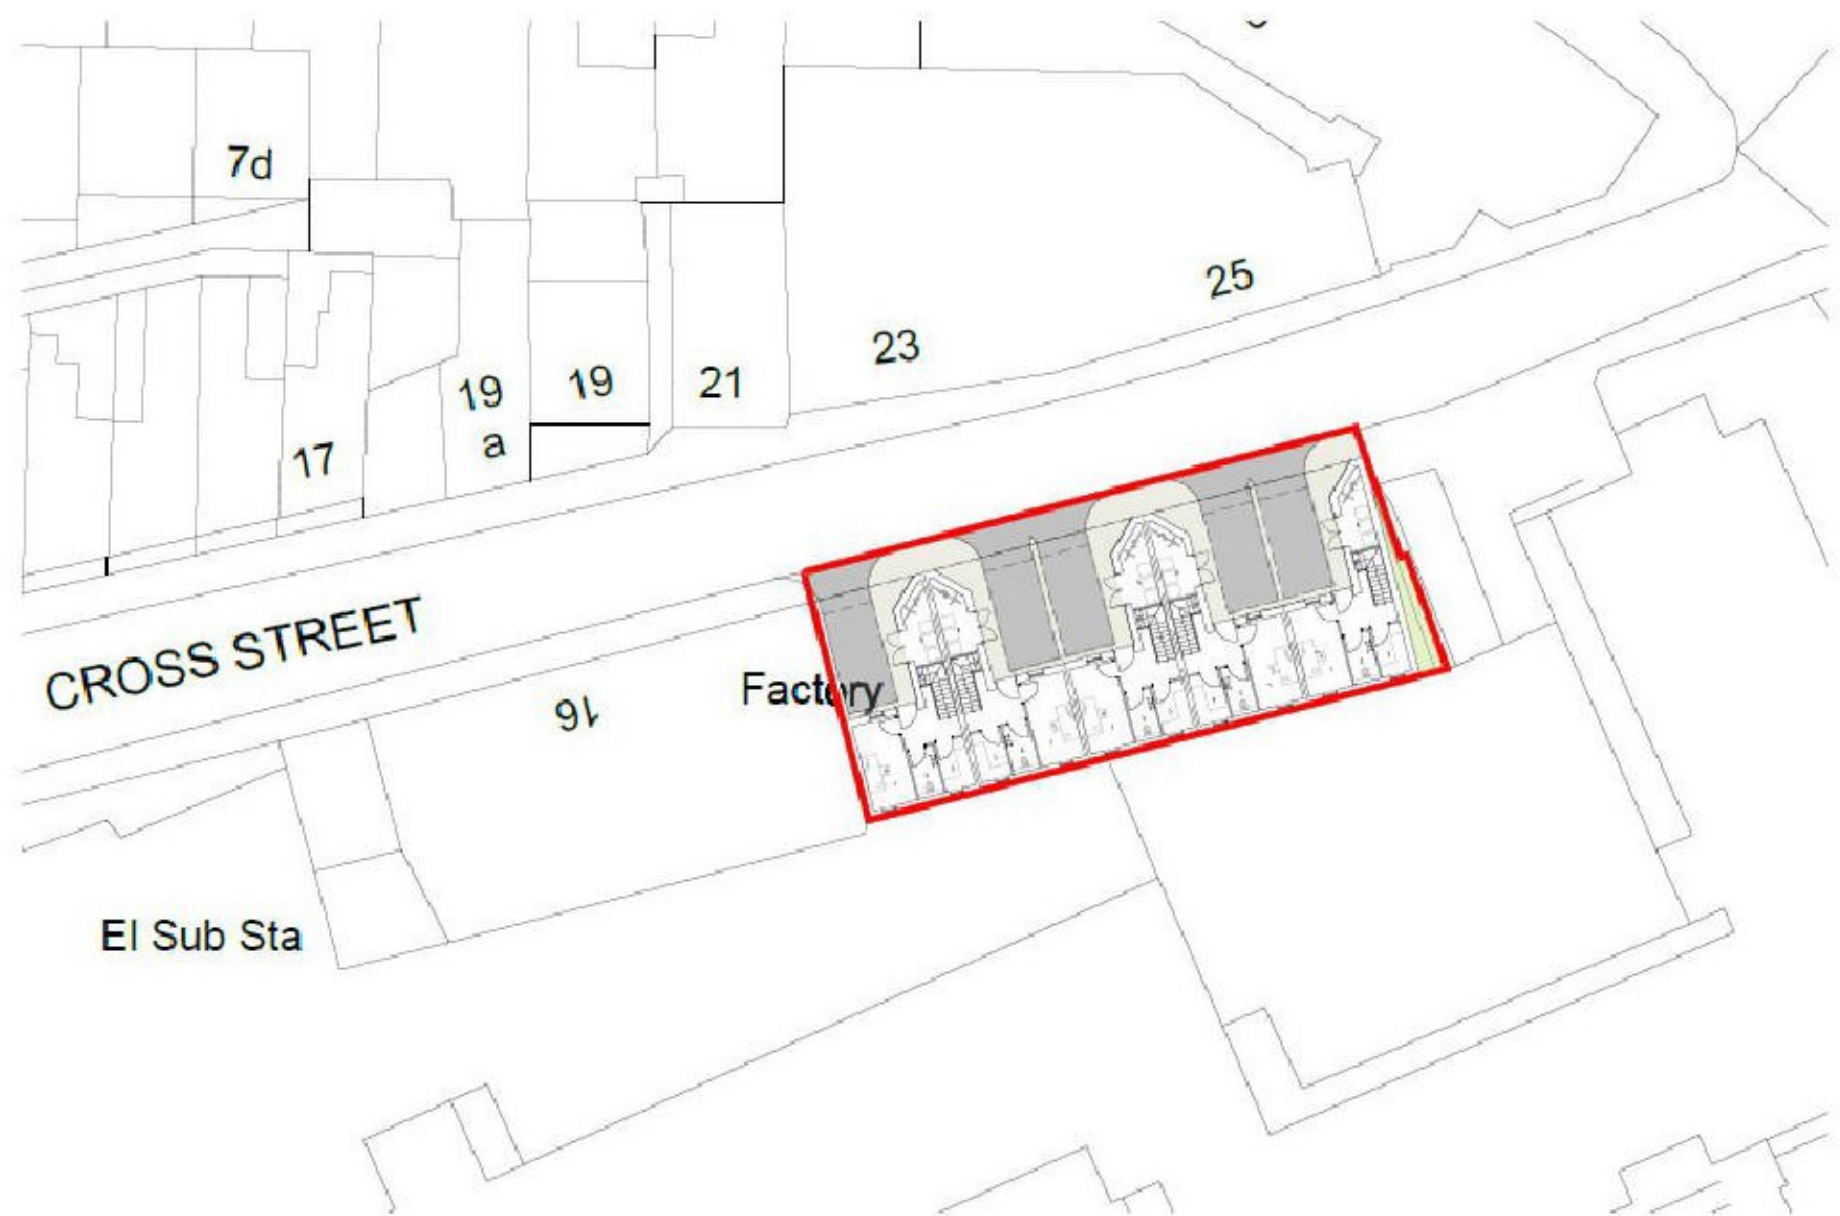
Proposed Site layout, drawing provided by Rickett Architects Ltd
